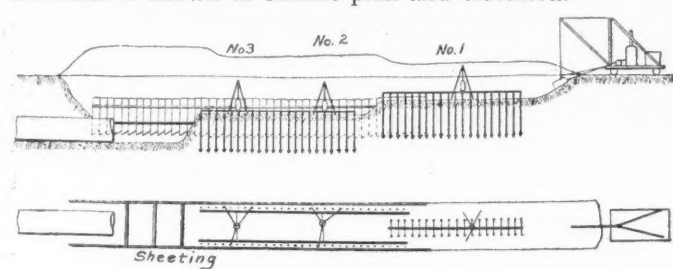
OUTLINE ELEVATION AND PLAN OF TRENCH
